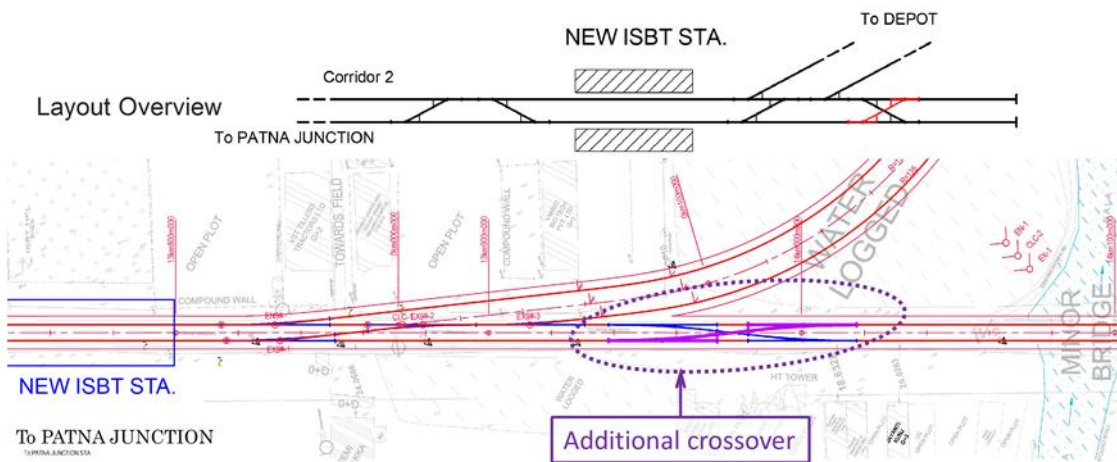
NEW ISBT Station Additional Crossover Layout (End Point Side)
